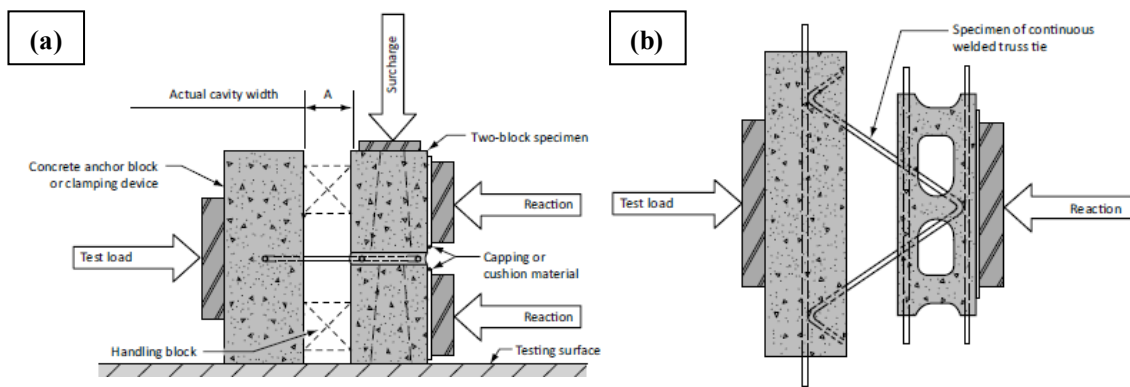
Compression tests on ties: (a) elevation view, and (b) plan view (CSA, 2014).
